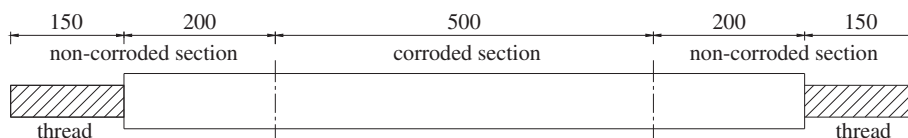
The structure and dimensions of the specimen (unit: mm).
